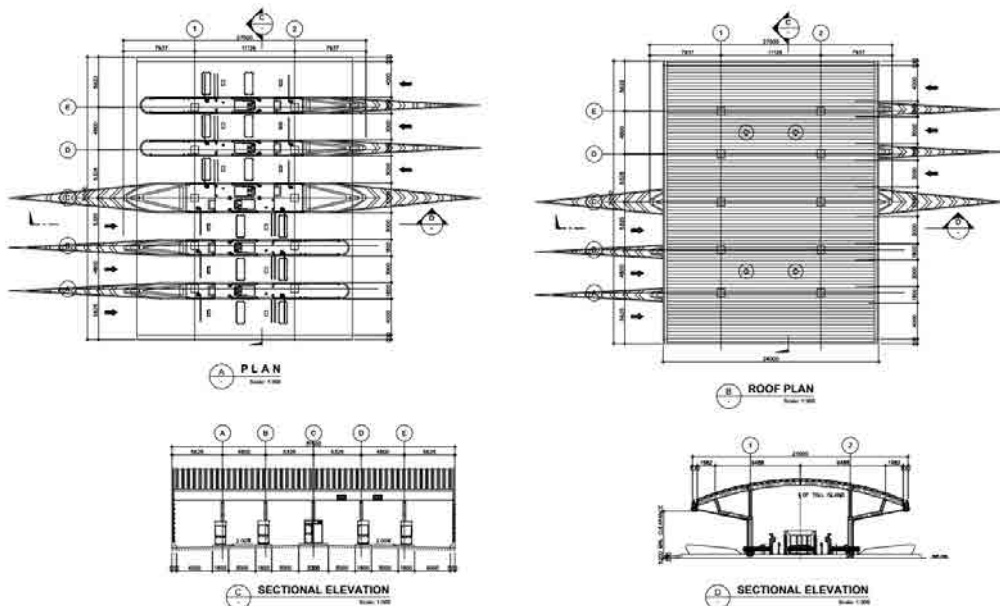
LAYOUT OF TOLL BOOTH
